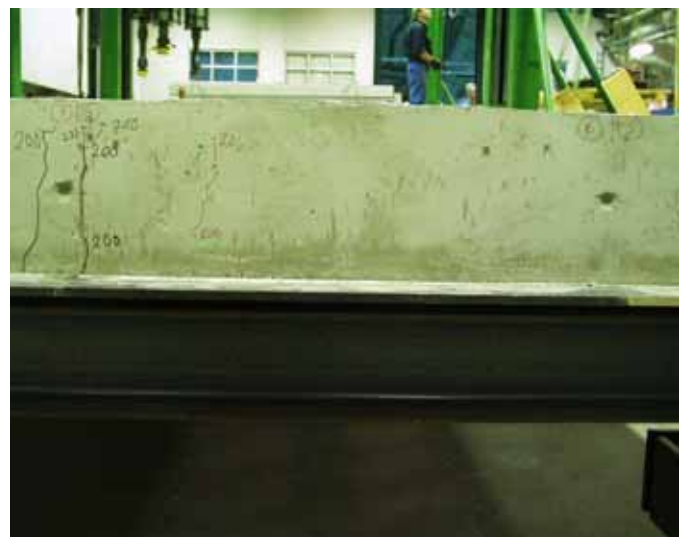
Cracks in Eastern tie beam after failure. Slabs 5-7.
